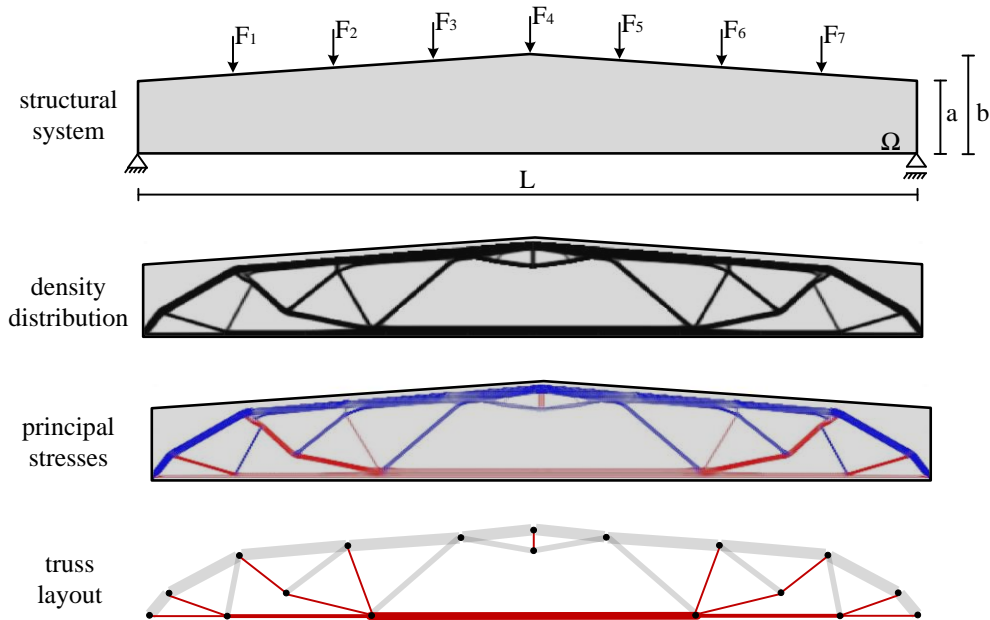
Consecutive development of a hybrid roof girder with topology optimization
